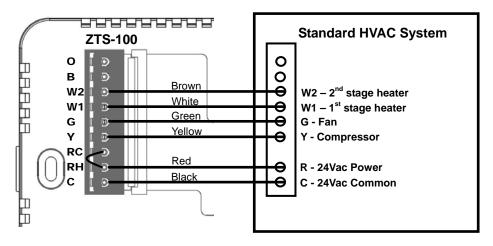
Non-heat pump (Standard Gas or Electric) HVAC system wiring
